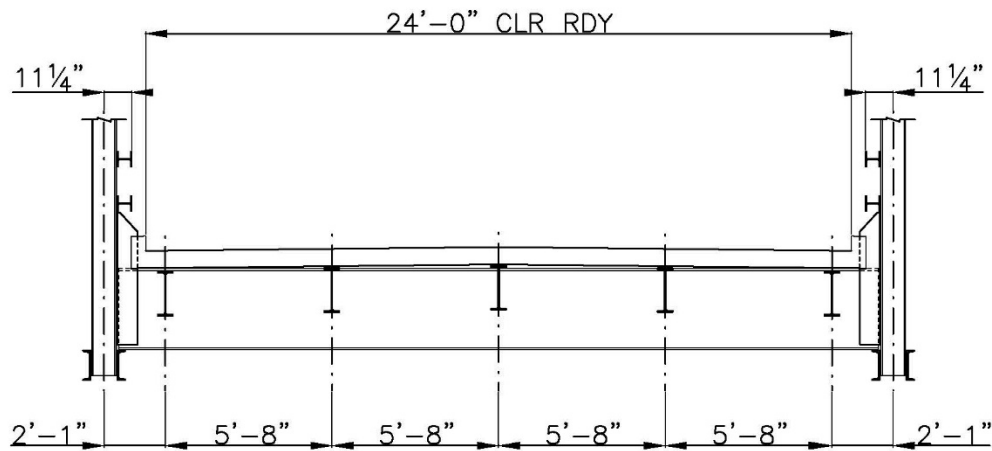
Typical Section of Existing Bridgeport Bridge Truss Span Superstructure
